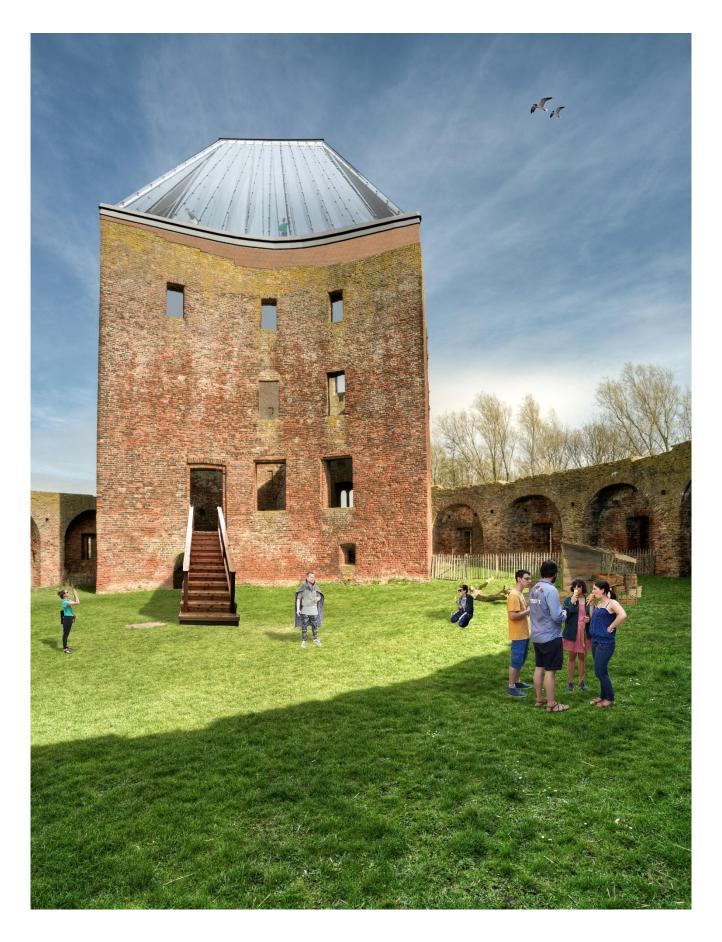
Render from within castle walls of the new roof. Source: own ill.
